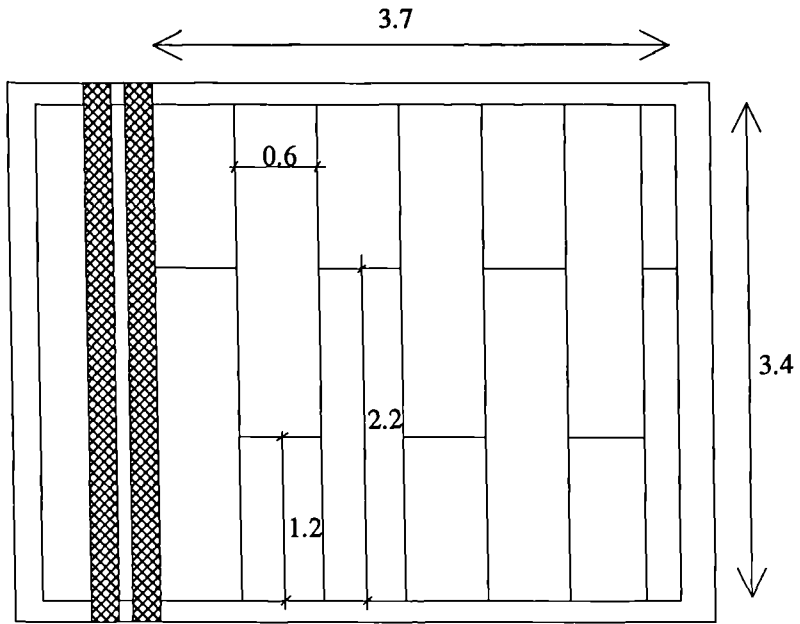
Plan of 18mm thick chipboard floor panels for the 150mm timber floor.
